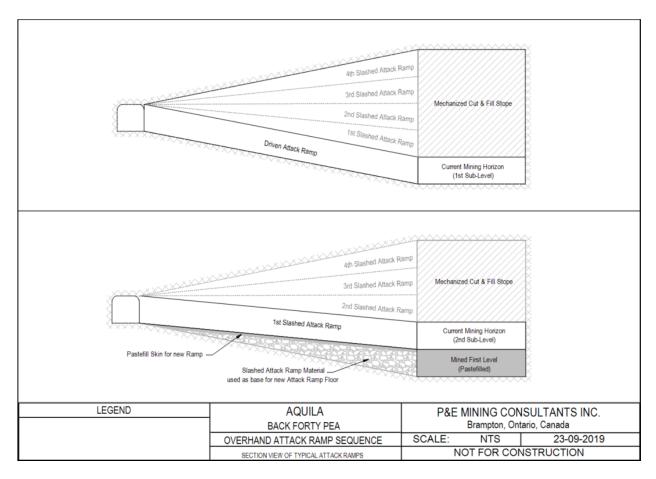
MECHANIZED CF MINING SEQUENCE SECTION VIEW
